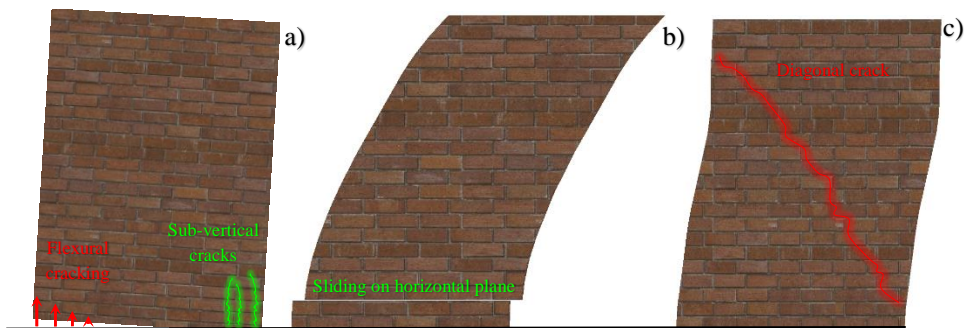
Typical behaviour of masonry pier: a) rocking mechanism, b) sliding failure and c) diagonal cracking.
